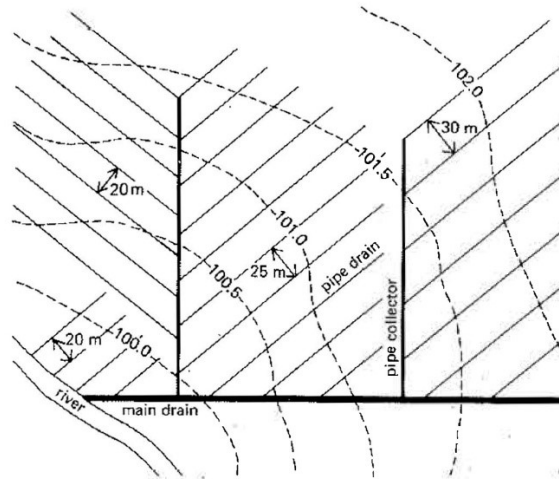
Typical lay out of a subsurface drainage system in a banana plantation in the Atlantic Region (Murillo, 1987)
